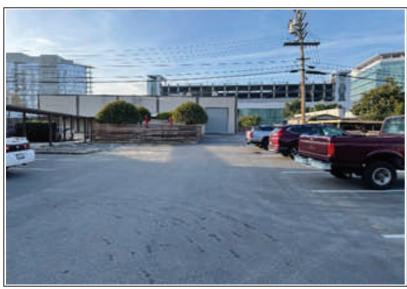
Photo of the approximate center of the project site. Facing southwest.
